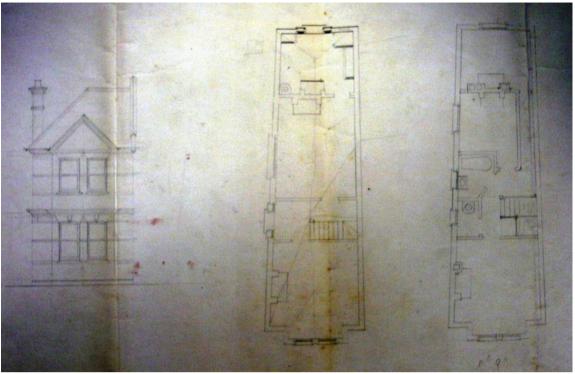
Drawings by Stone for house on the corner of Muirkirk Road and Merchiston Road. The standard plan had to be elongated to achieve a setback from the pavement. This was probably a requirement from the district surveyor whose responsibility it was to approve the building line along the street frontage (Ibid., Item 629).
